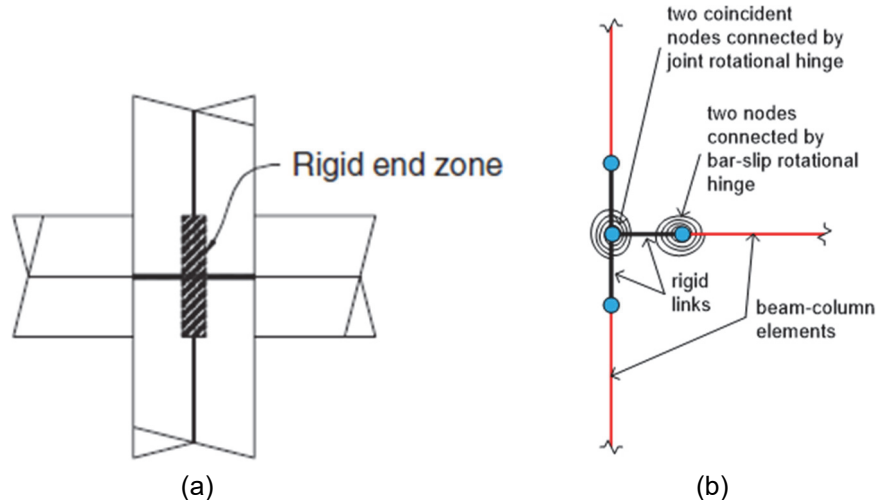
Recommended element configurations for modeling (a) stiffness adjustment of beam and column offsets (Elwood et al., 2007), and (b) joint center rotational spring in a planar frame (Celik and Ellingwood, 2008).
